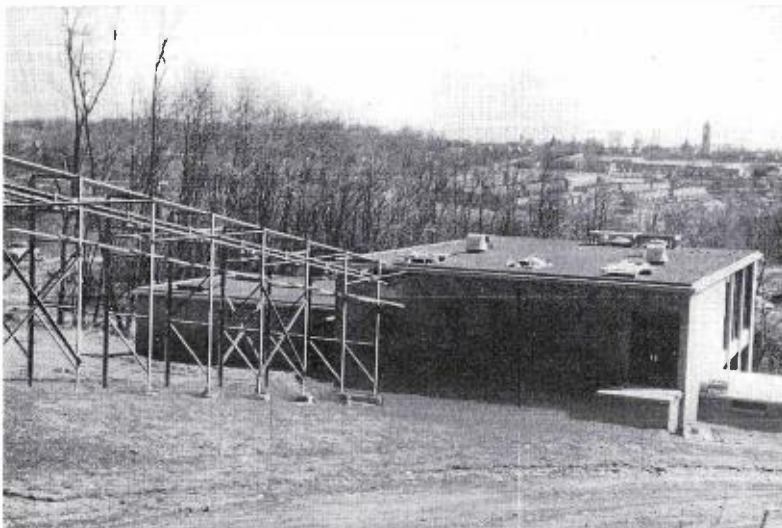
The transmission line of each station is run to the tower on a steel frame as shown here at the WBAL building. Small pipes have been mounted over the lines to prevent damage from falling ice.
